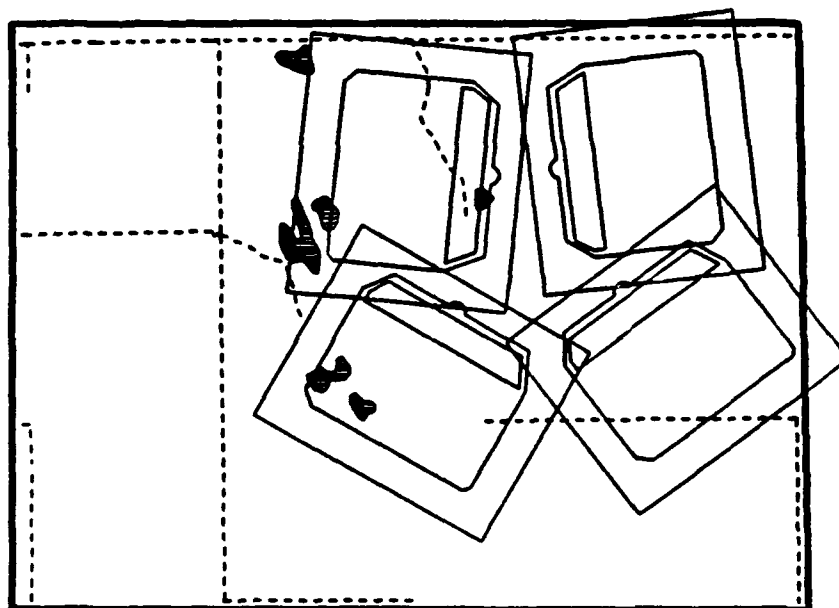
TX-NORTH PRELIMINARY SITE LAYOUT
